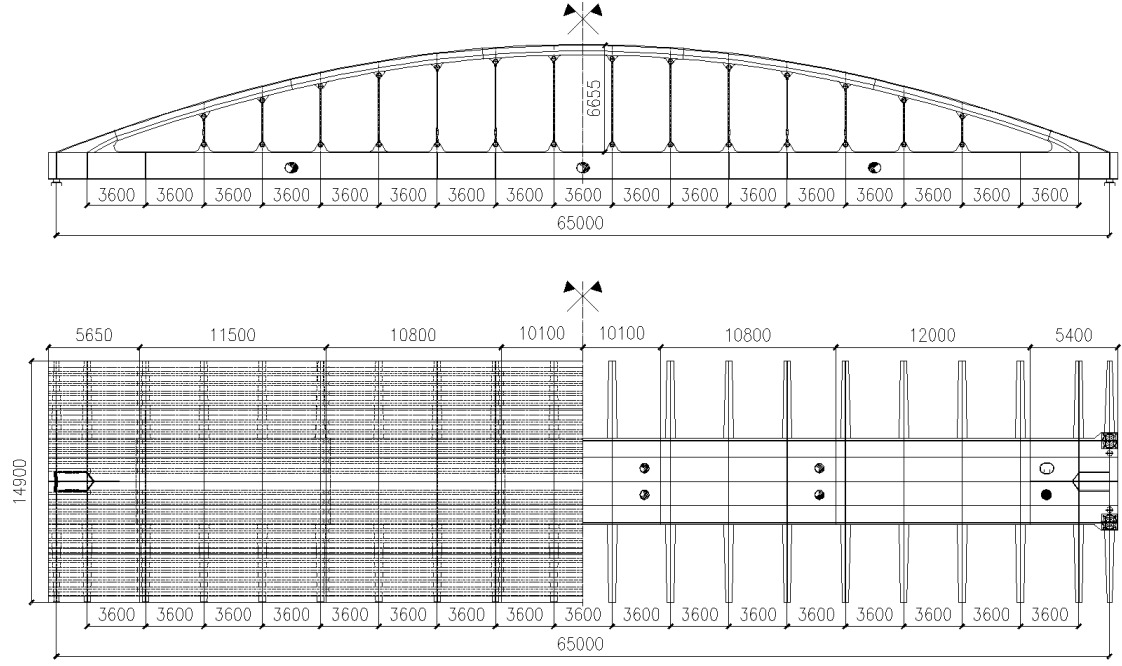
Elevation showing the original design of the bridge over the Carpi's highway station, longitudinal profile and deck plan respectively.
